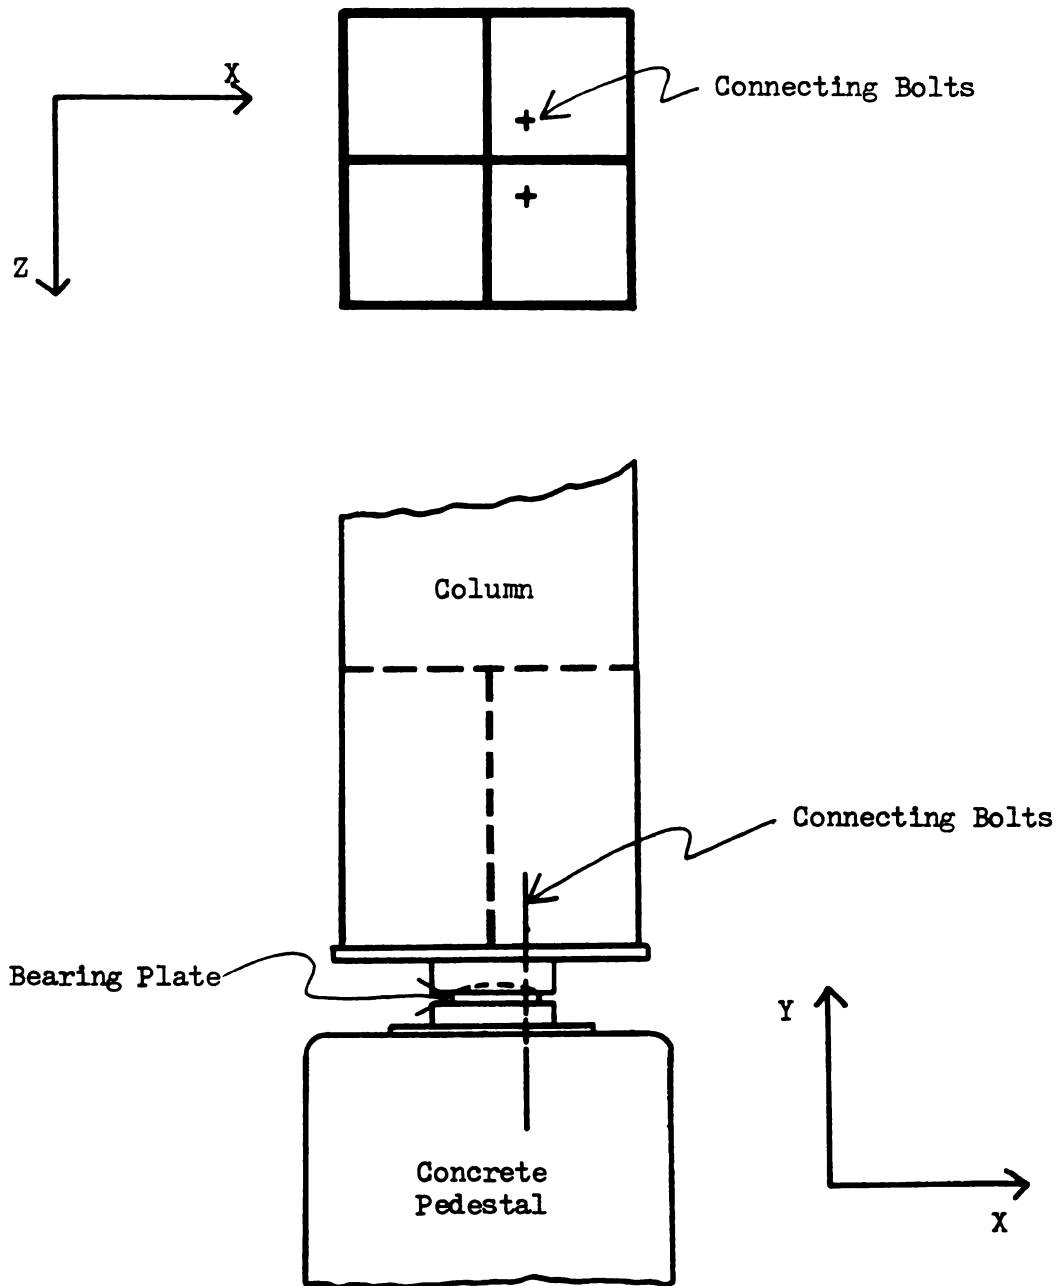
CSCB Column Cross-section and Pedestal Connections
